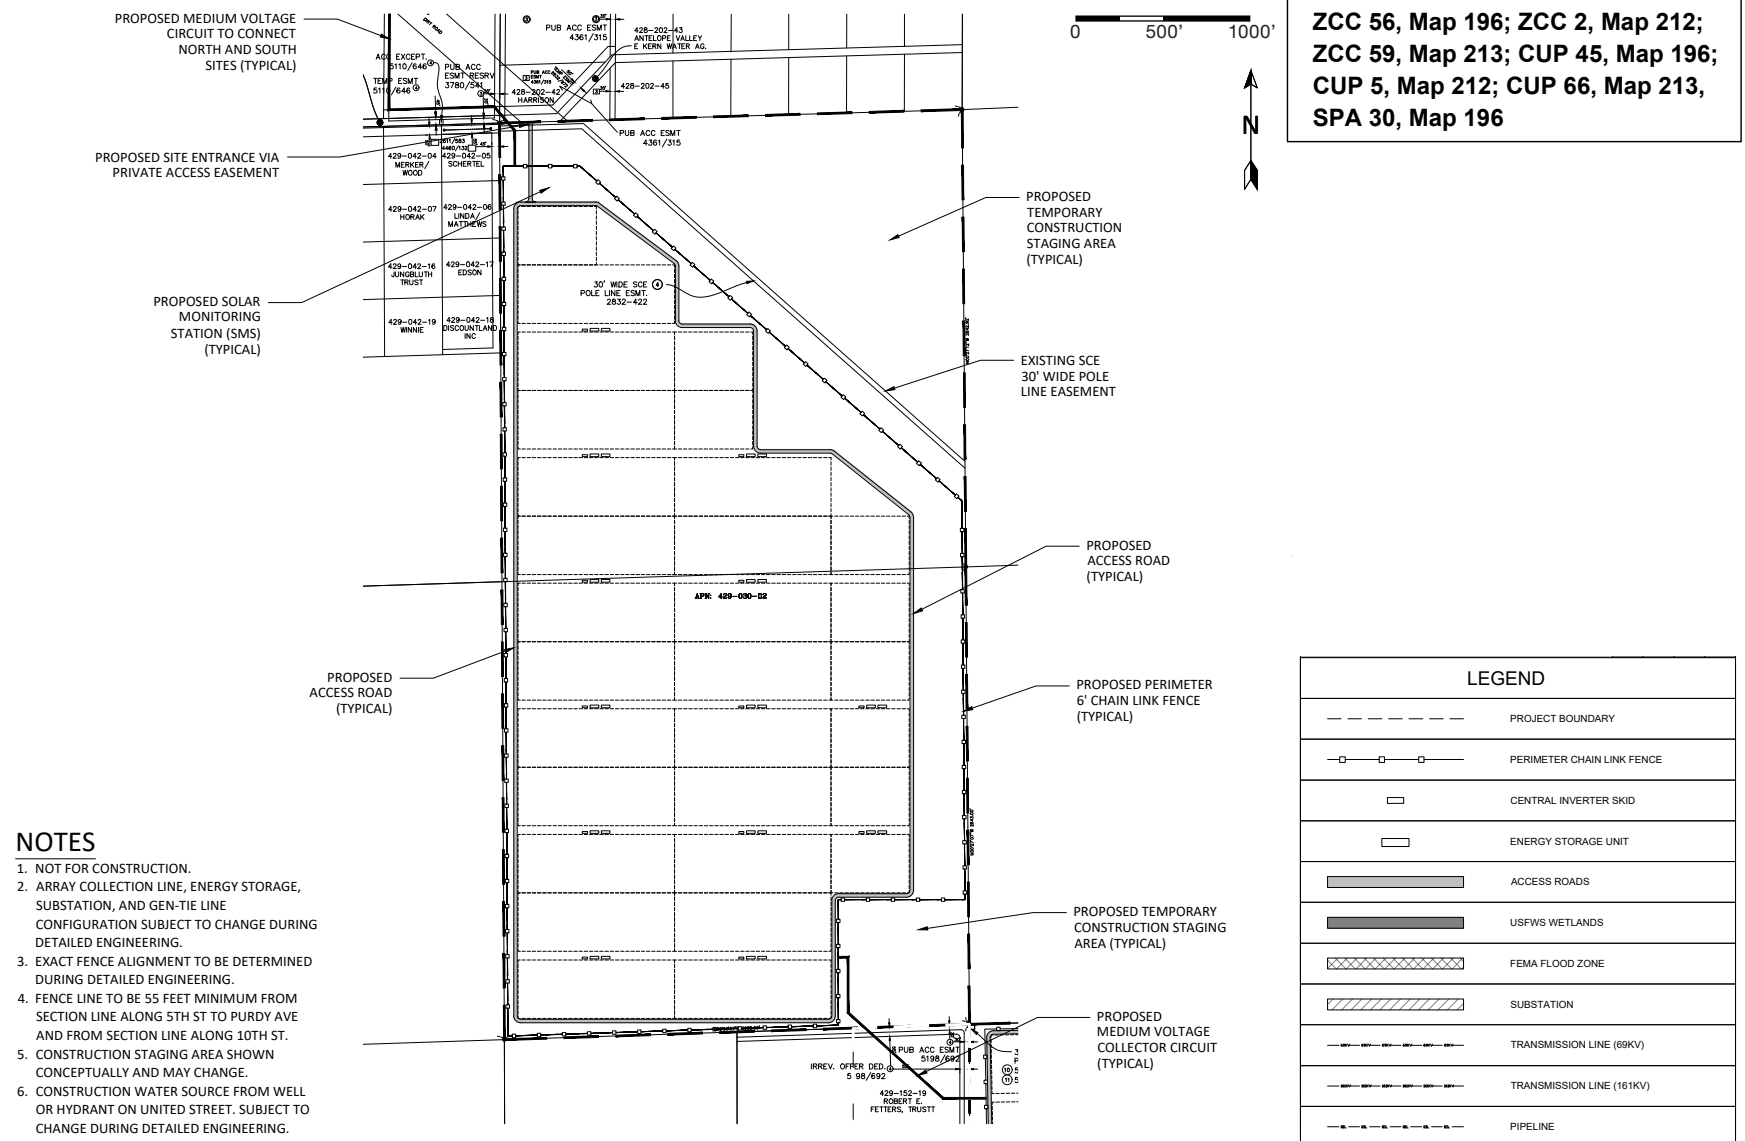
A: SOUTHERN SITE PLANS - PART 1
